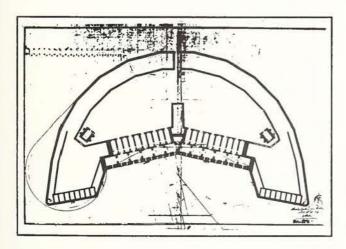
Plan of the Amsterdam Battery, 1791 (Cape Archives, M/1084).
